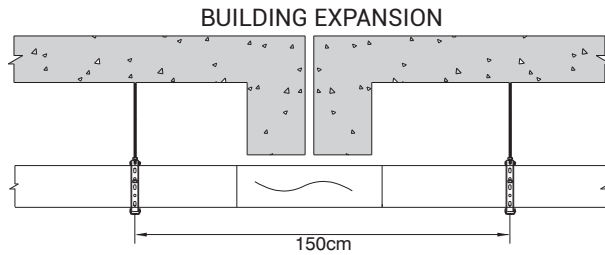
YDT BUILDING EXPANSION APPLICATION
